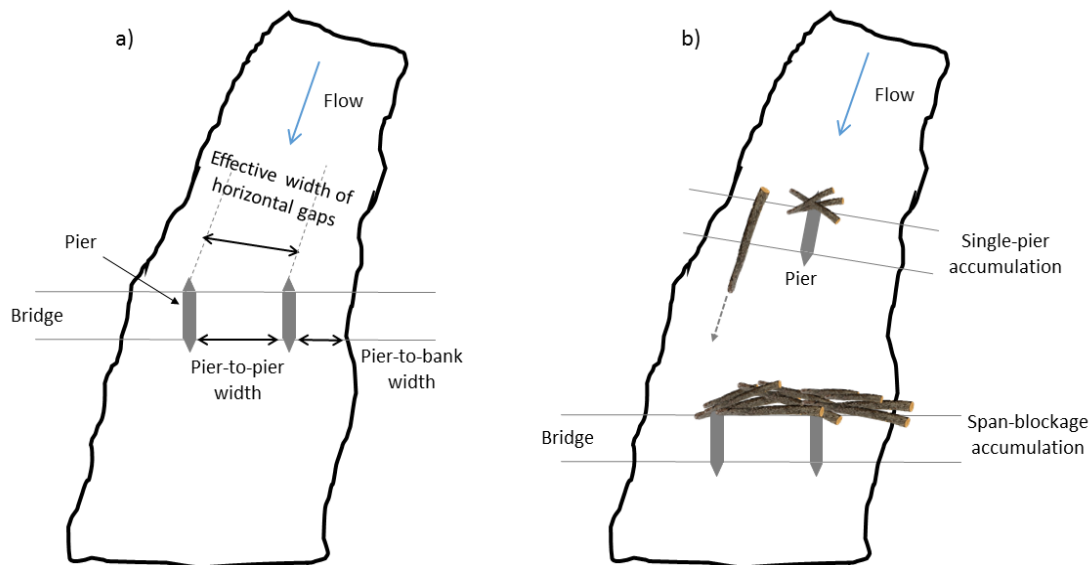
Plan view scheme of the effective opening between bridge piers (a) and of the types of wood accumulation at bridges (b).
